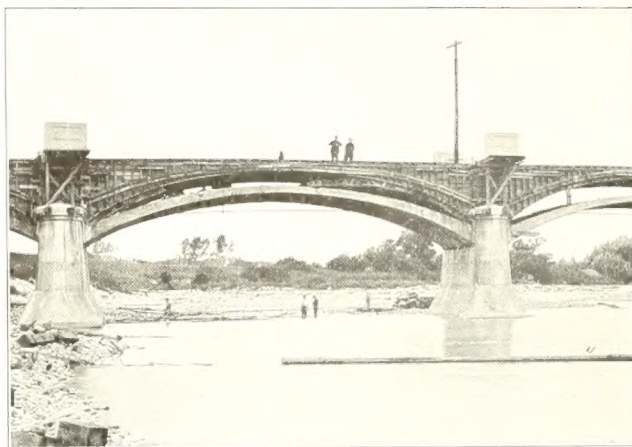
ADAMS STREET BRIDGE, AUGUST 21, '22.
